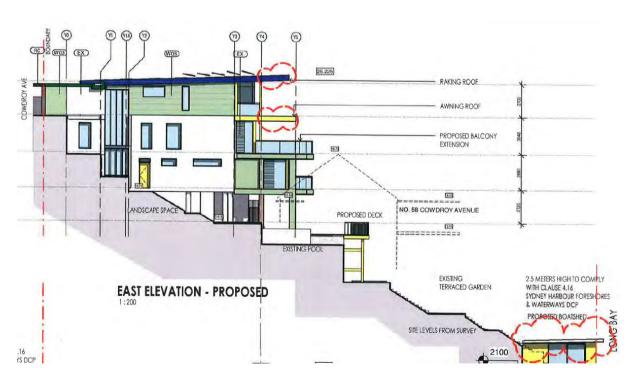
Approved eastern elevation of DA153/19 as modified for No.56 Cowdroy Avenue (which is oriented to the boundary shared with the subject site)
